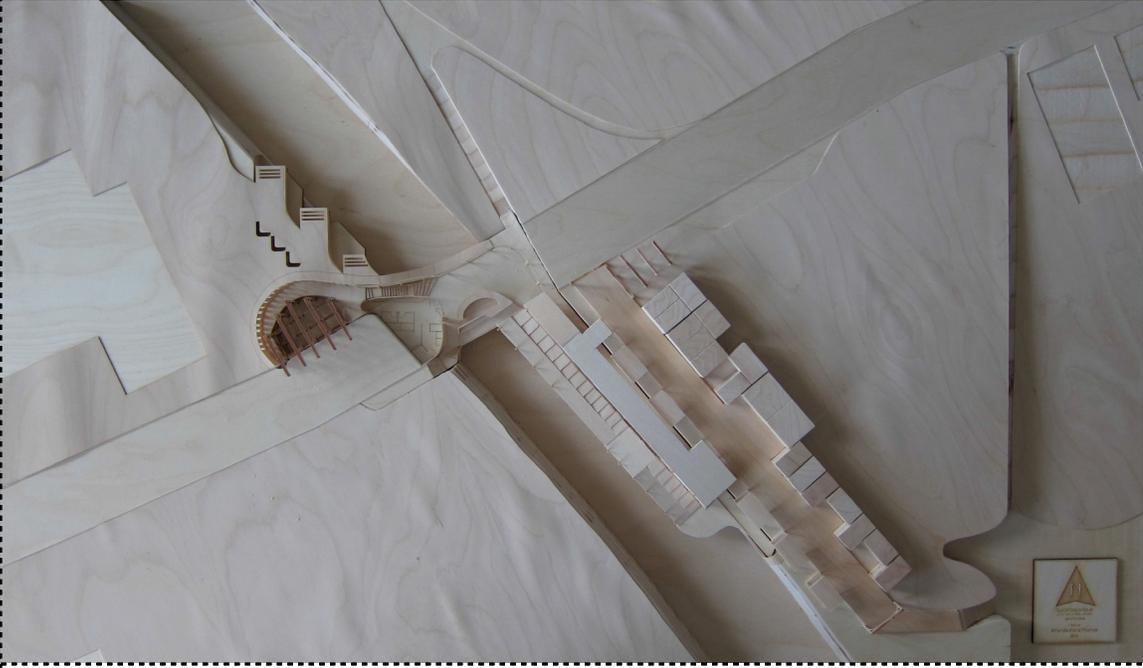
North-facing View Looking Towards Grocery Shops and Outdoor Pavilions
